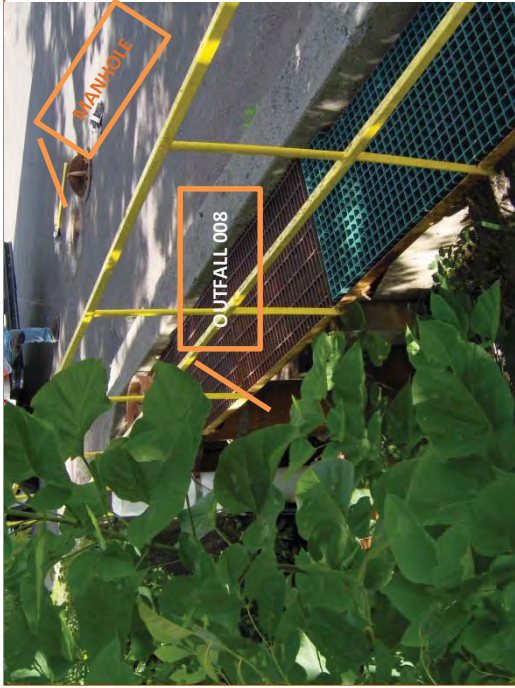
Manhole upgradient west of Outfall 008 which is not connected to the outfall
